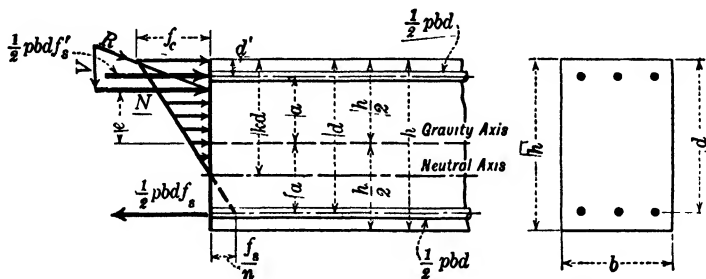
Stresses Caused by a Force Producing Compression and Tension upon a Reinforced Section, Tensile Strength of Concrete Neglected. (See p. 180.)
